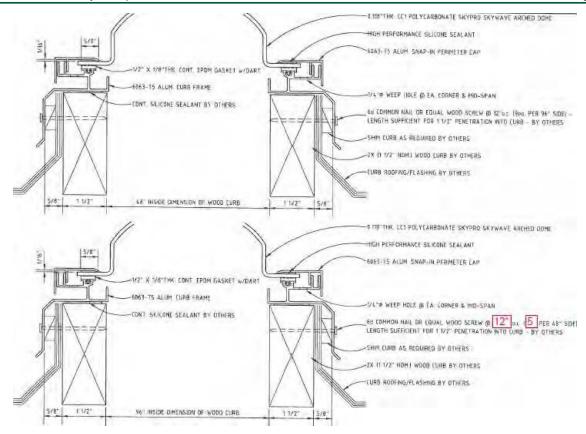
SKYLIGHT INSTALLATION DETAILS FOR MODEL A-S-CM
